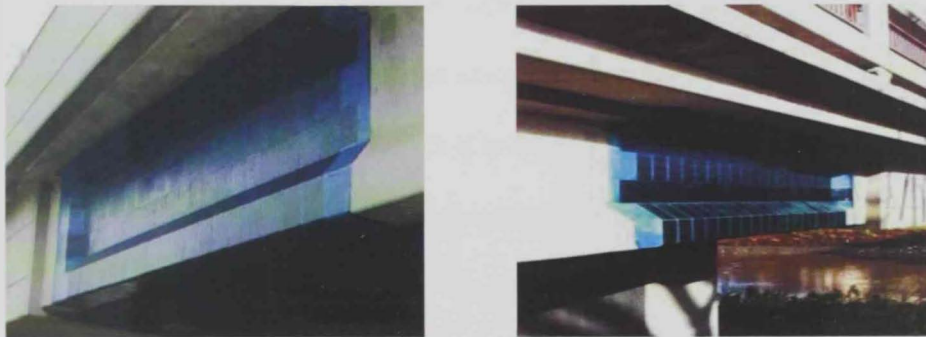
Shear strengthening of bridge girders using externally bonded FRP composites (ISIS Canada 2006)
